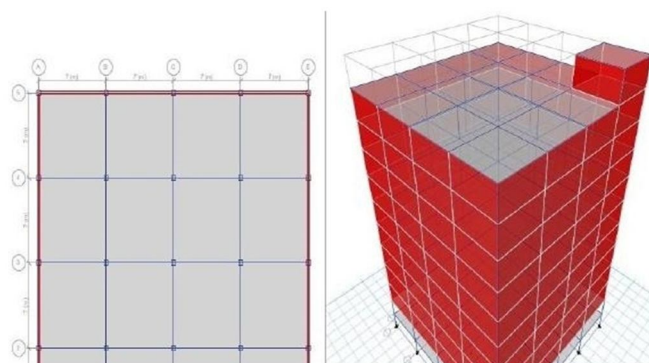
Plan View (Left) and 3D ETABS Model (Right) of CFST Composite Frame (Model B) – 450×450 mm CFST Columns, G+10 Storey
